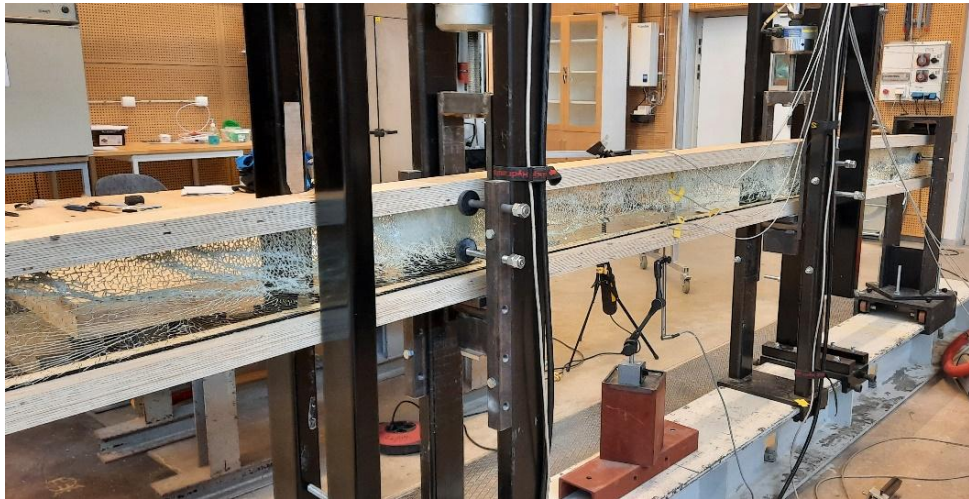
Beams standing after failure of the beams with one-layer float glass and one-layer heat-strength glass.
